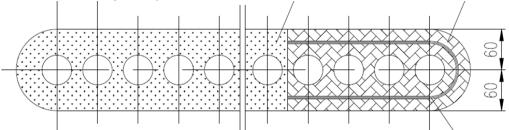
The above drawing shows the improper anchor design to hold the refractory. A steel used for anchor should not have large thermal expansion. If so the refractory would certainly break away.
